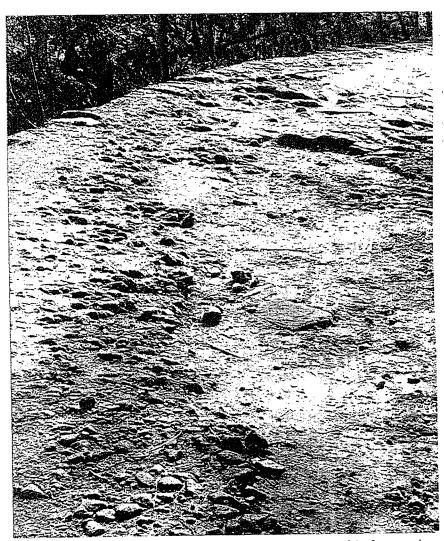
Typical pavement construction, Devines Hill. Remnants of the fine gravel course are visible near the retaining wall
